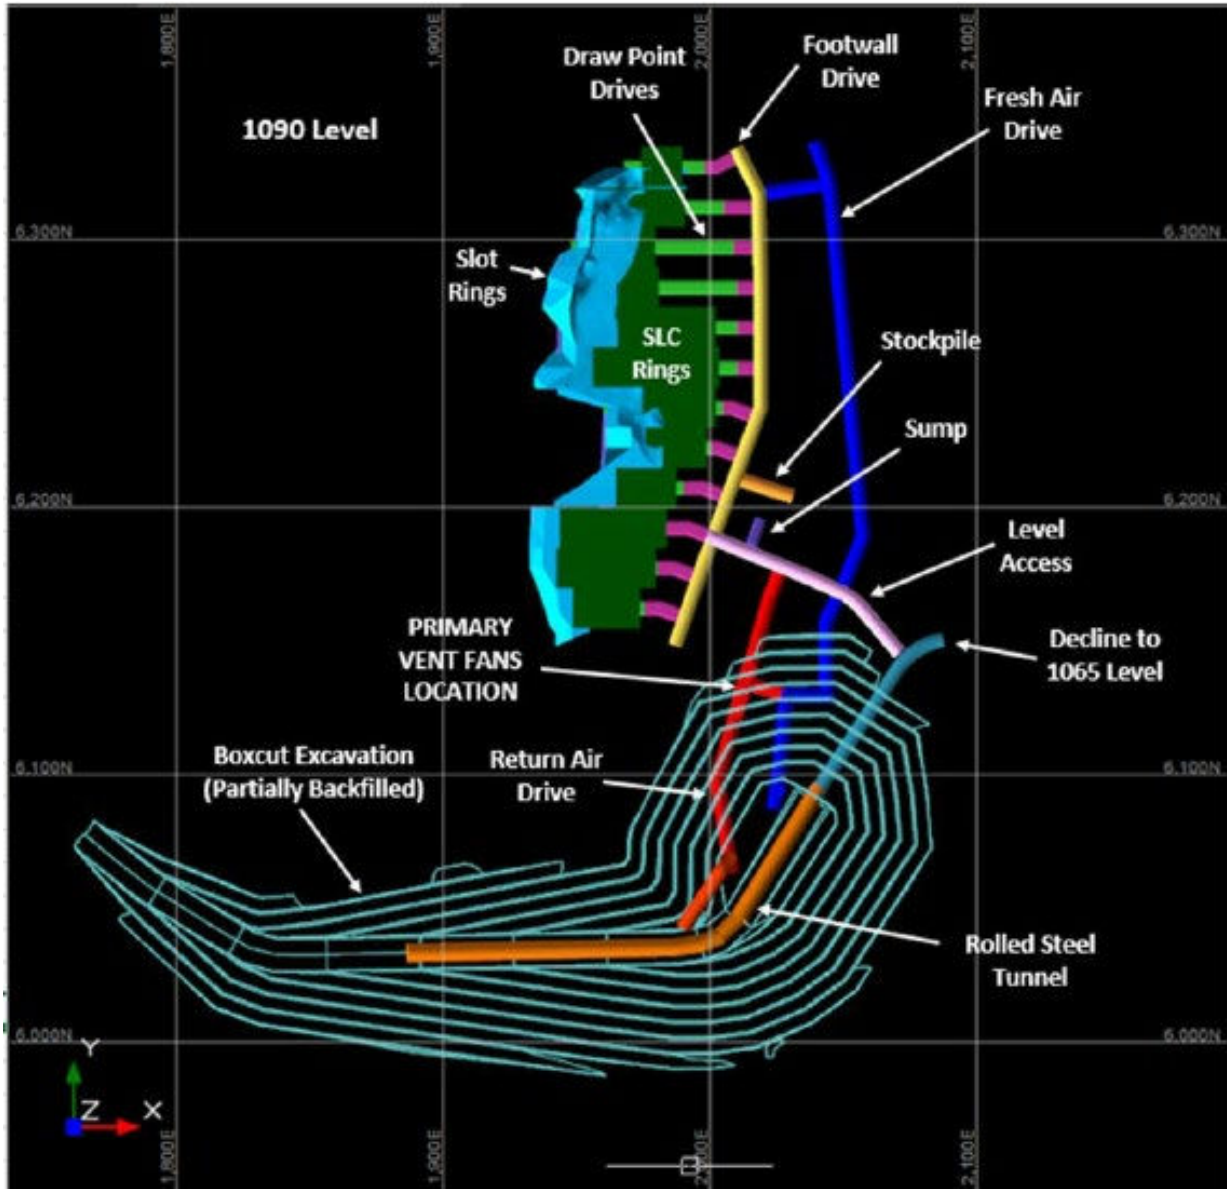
Plan view of the ESS underground design from the portal to the 1090 level
